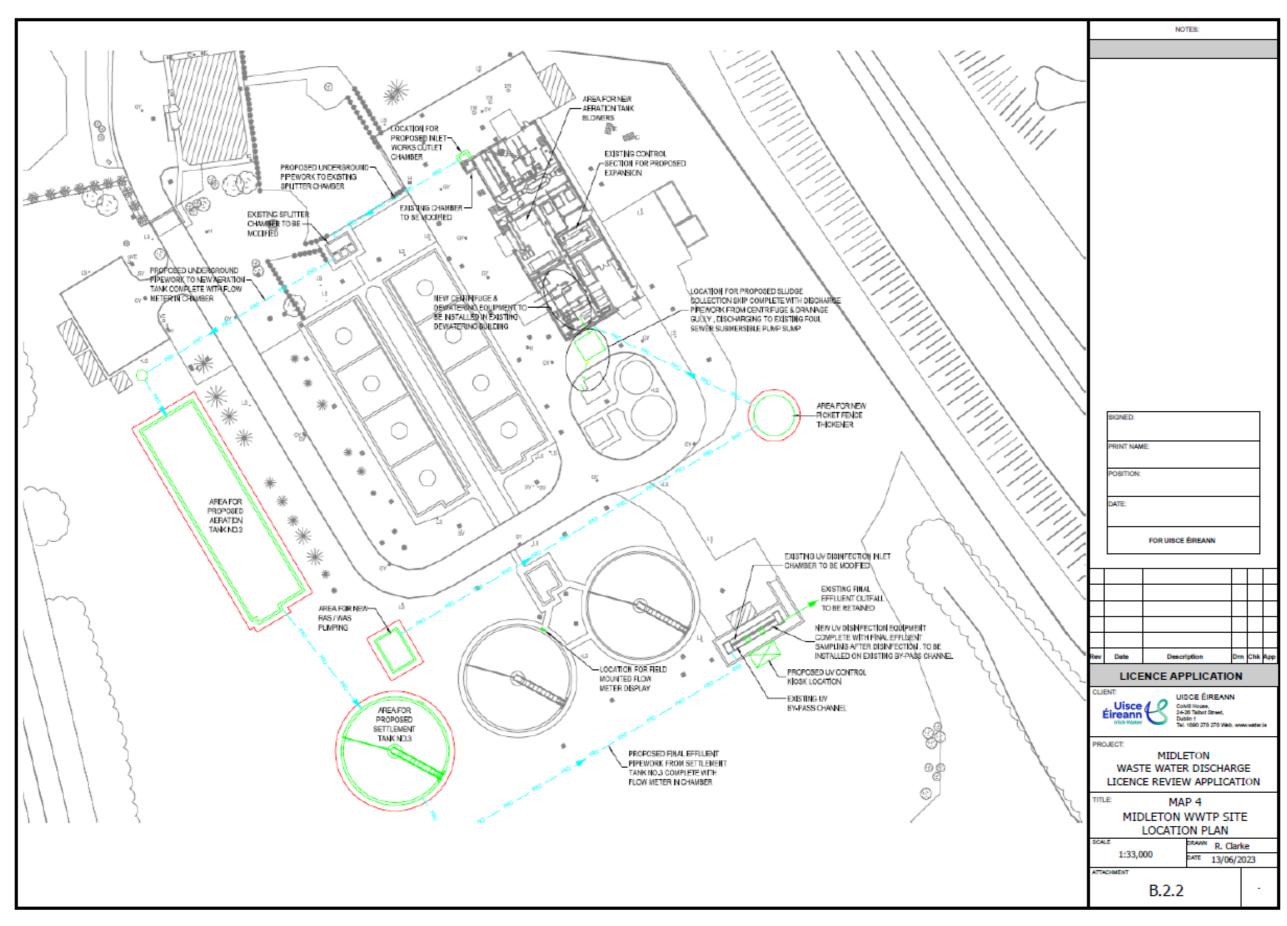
Midleton Wastewater Treatment Plant Layout
